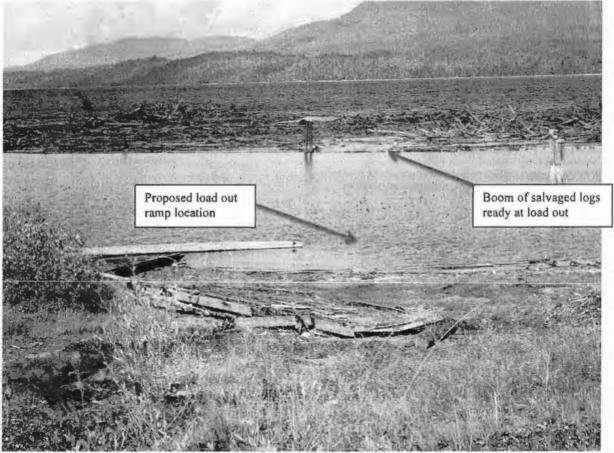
Existing boom of salvaged logs and proposed load out rump location
